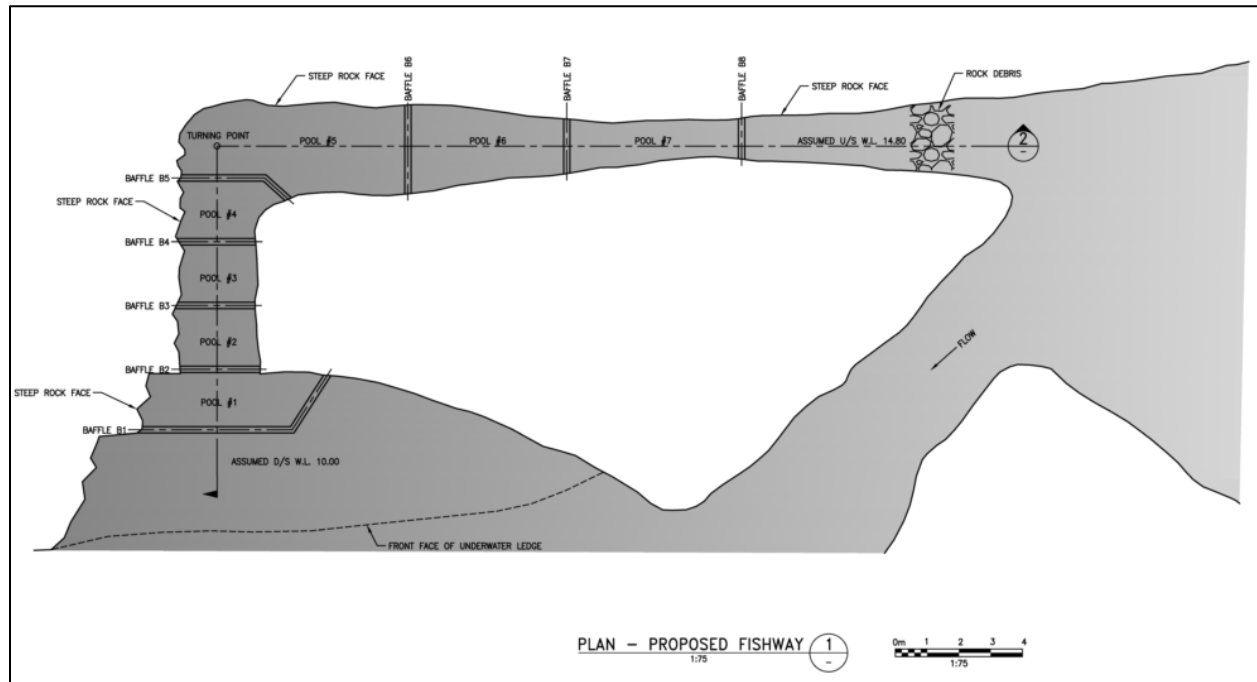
Plan View of Proposed St. Lewis River Fishway
